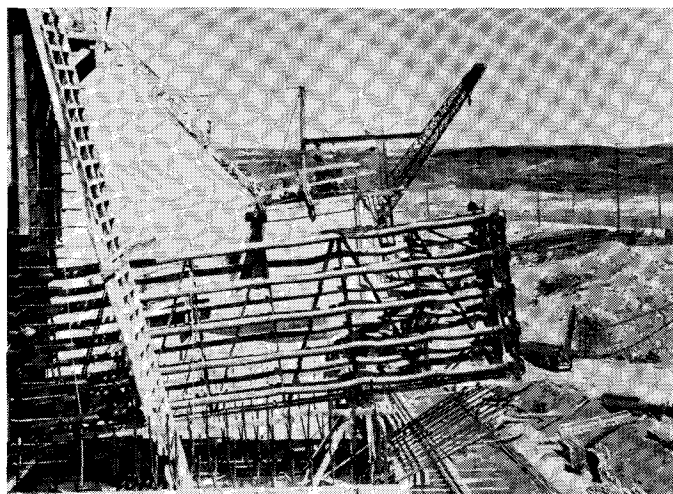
Wanapum Dam—Assembly Being Lifted into Place
